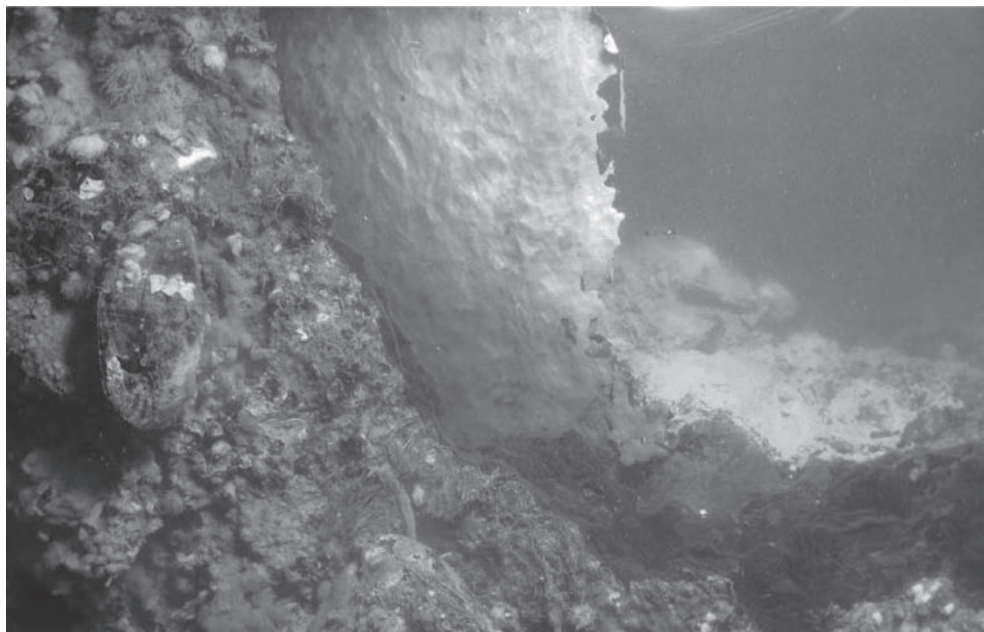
Dumbarton pier 6, Northwest caisson, SW Quadrant, 6.5-ft below MLW with large void (28'W × 2.3'H × 5'D) in caisson.
